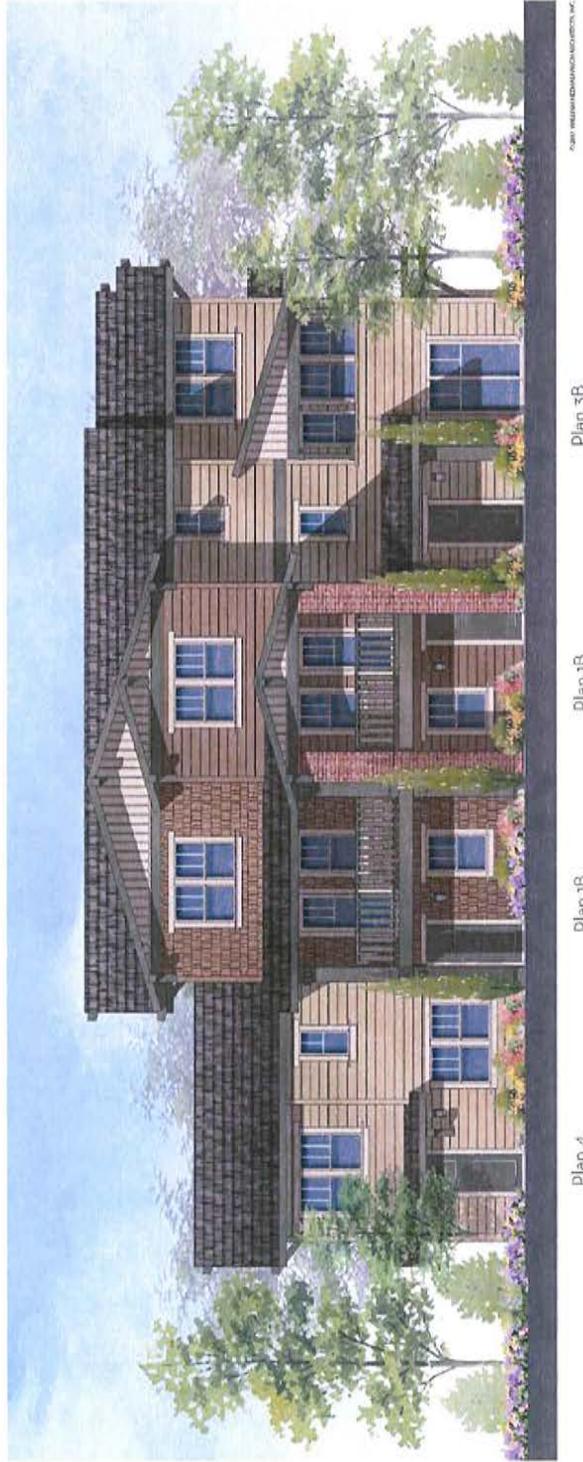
4-Plex A Front Elevation - Building 3 & 9
